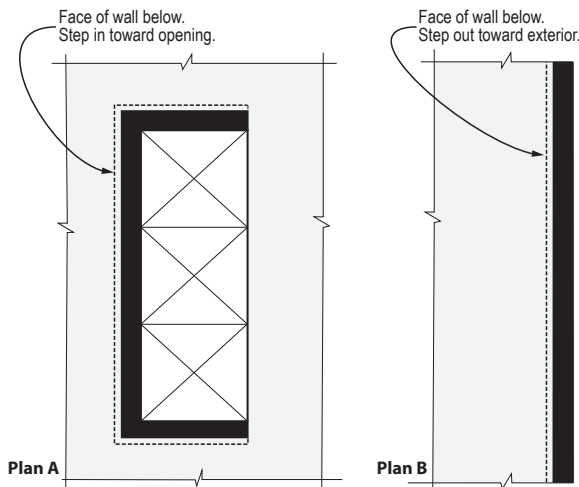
Wall faces defining opening edges and exterior of structure are normally held over the building height. Reductions in wall thickness are therefore made by shifting one form face toward an opening or the building exterior.
